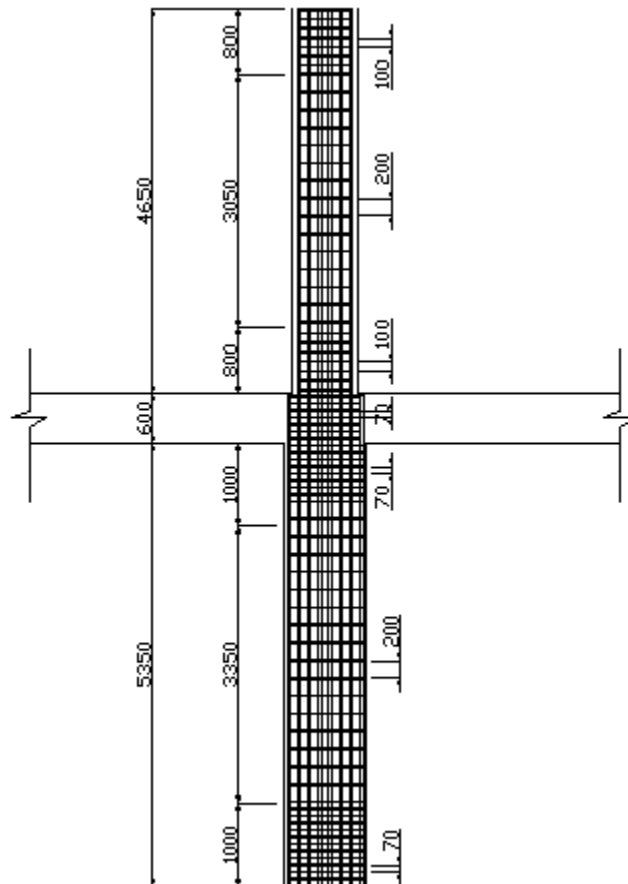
Longitudinal Reinforcement for Ground Level and First Floor Columns
